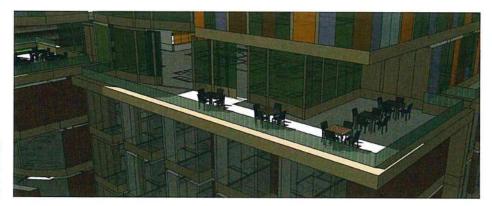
Concept Development Building Edge 5th Floor Source - B. Kimball
